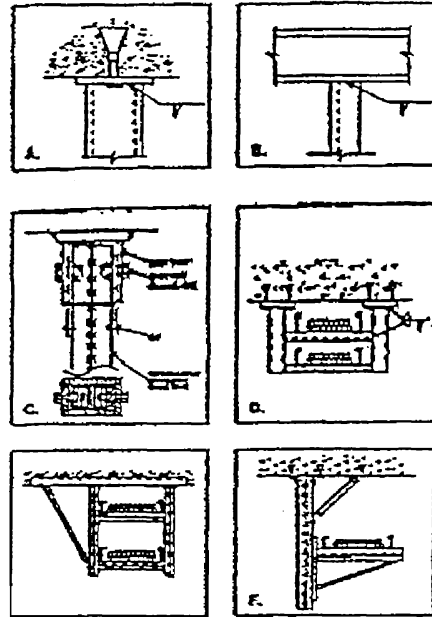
Examples of potentially nonductile raceway support connection details and configurations
